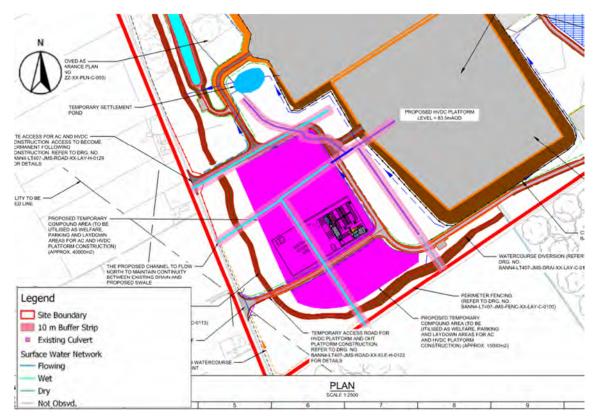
Location Plan Showing the Proposed Area for the Temporary Laydown and Welfare and the Watercourses or Ditches Impacted.
